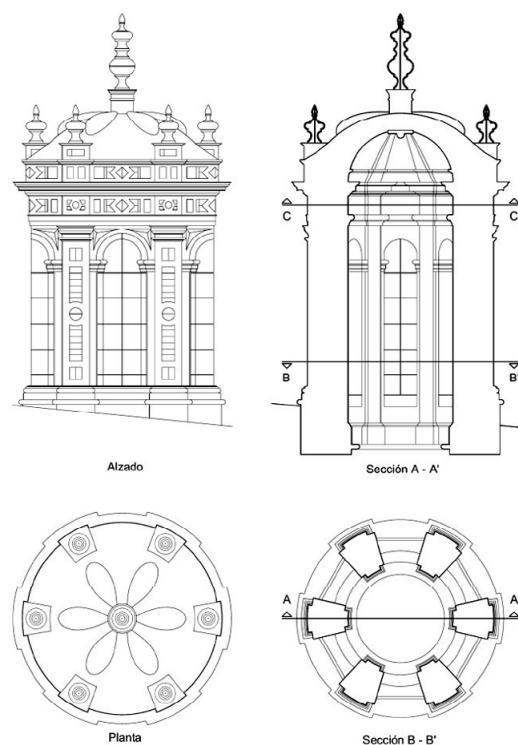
CAD floor plan of the lantern L7. Royal Tobacco Factory. Original work.
